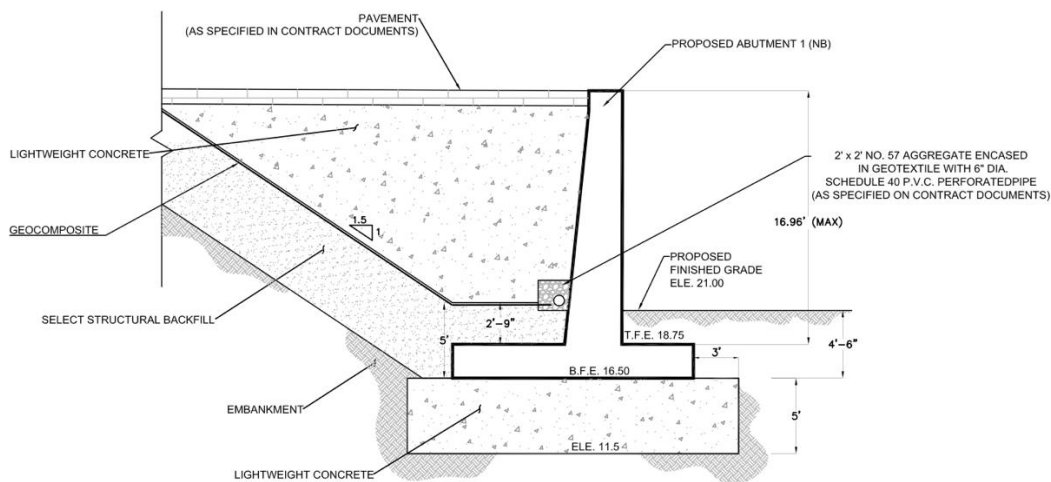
Typical cross section for Abutment 1(NB) (0095 Over Shackamaxon Street, S-26064).
